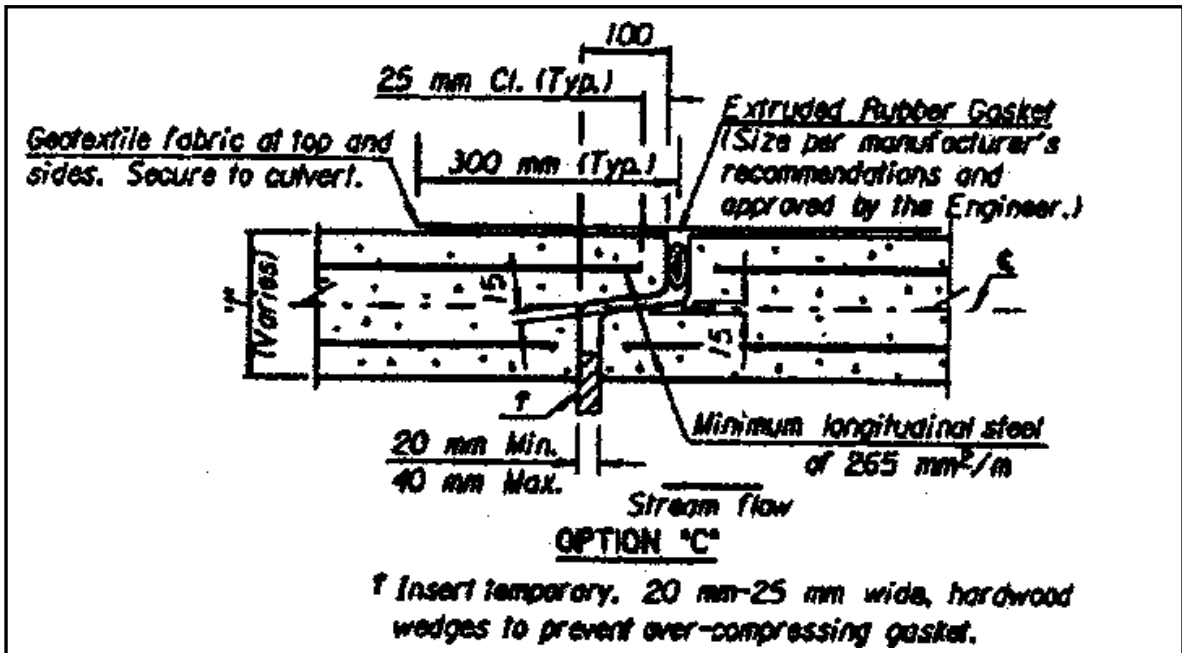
Extruded Rubber Gasket & Geotextile Fabric
